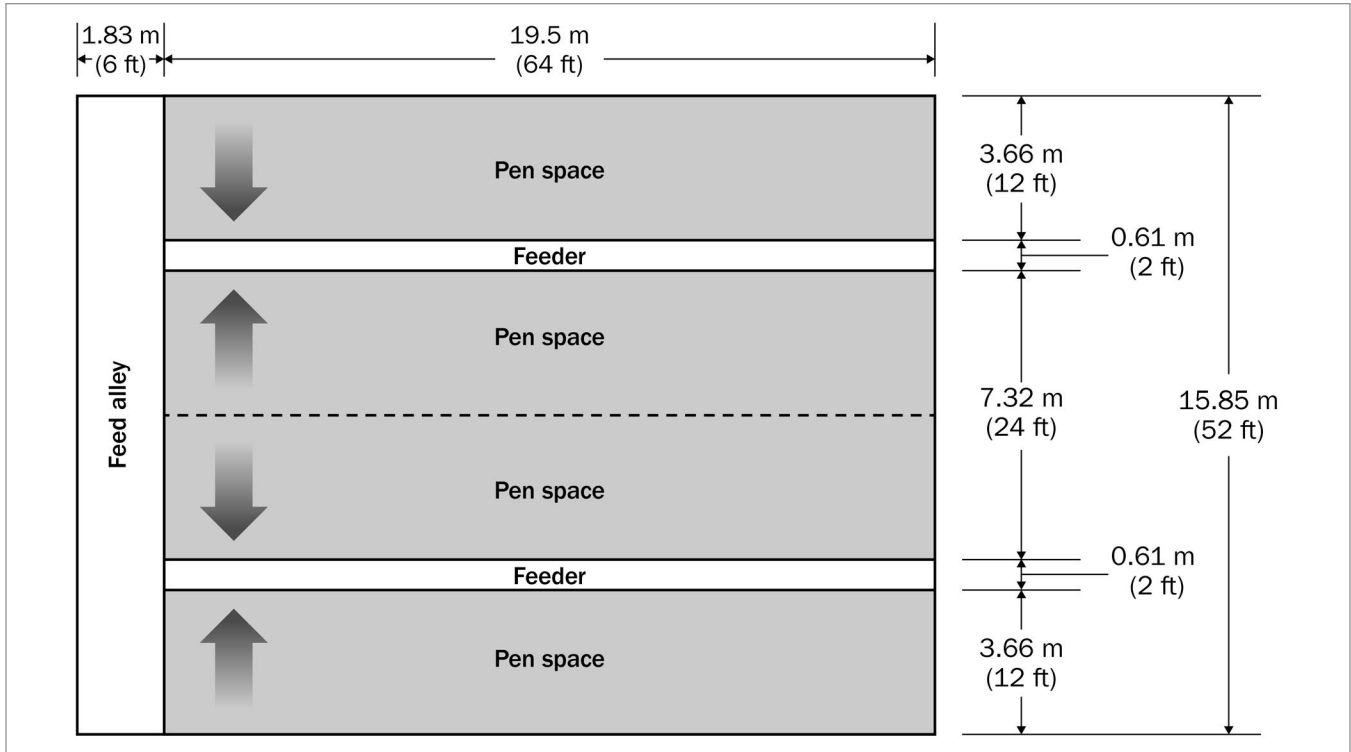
Schematic of a barn plan with appropriate bunk and floor space for ewes.
